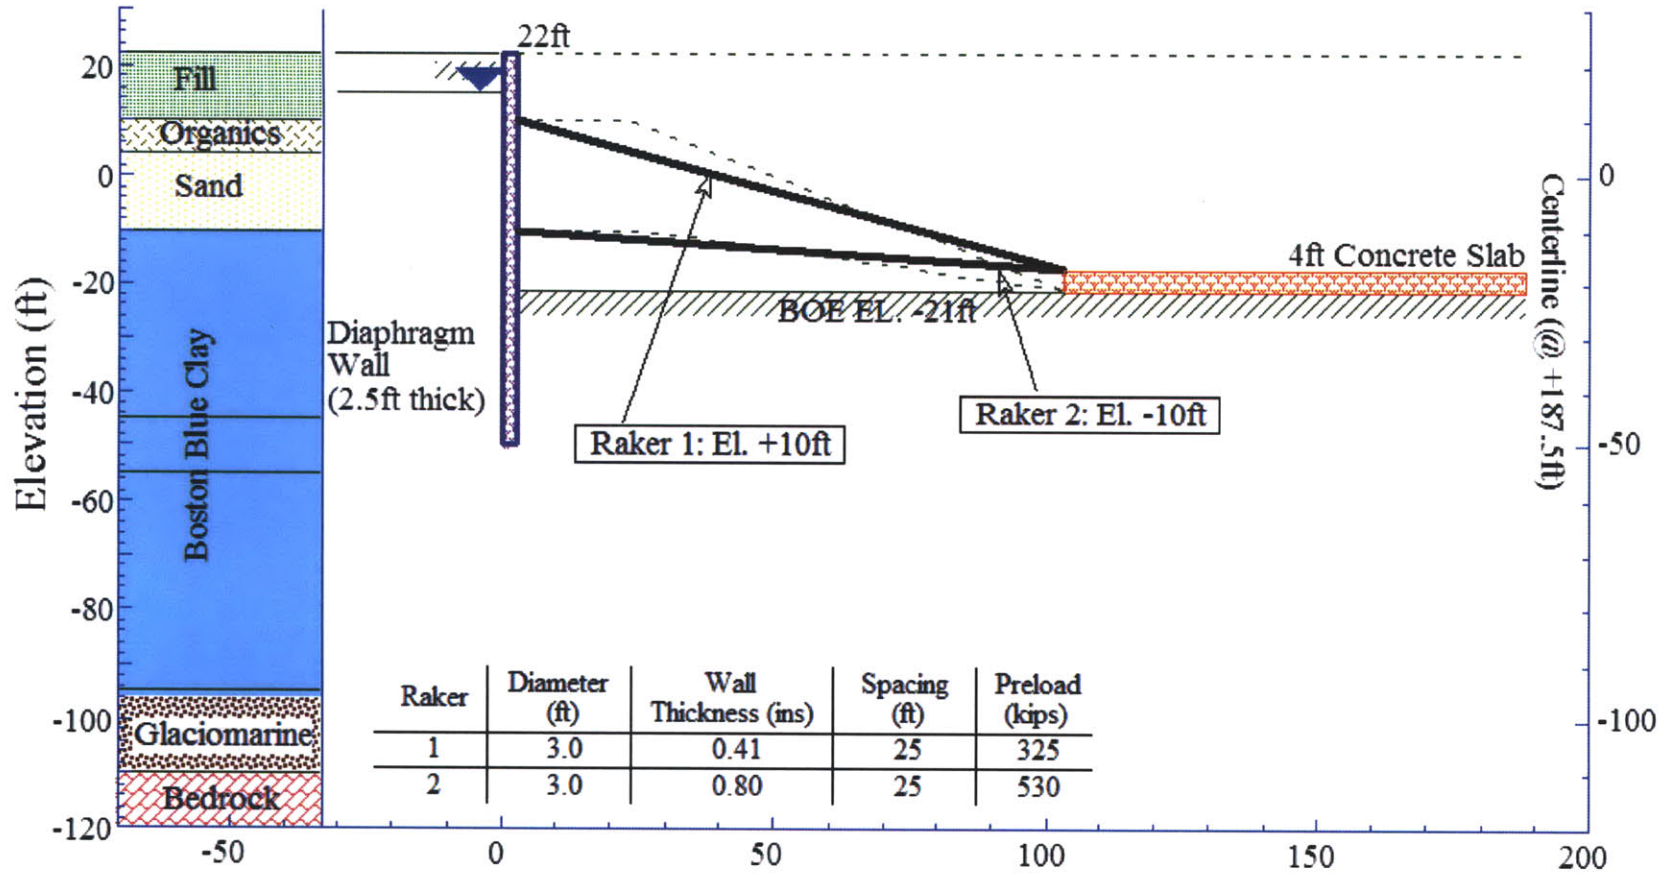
Typical Cross-Section of Rakers and Excavation (after Whittle, 2002)
